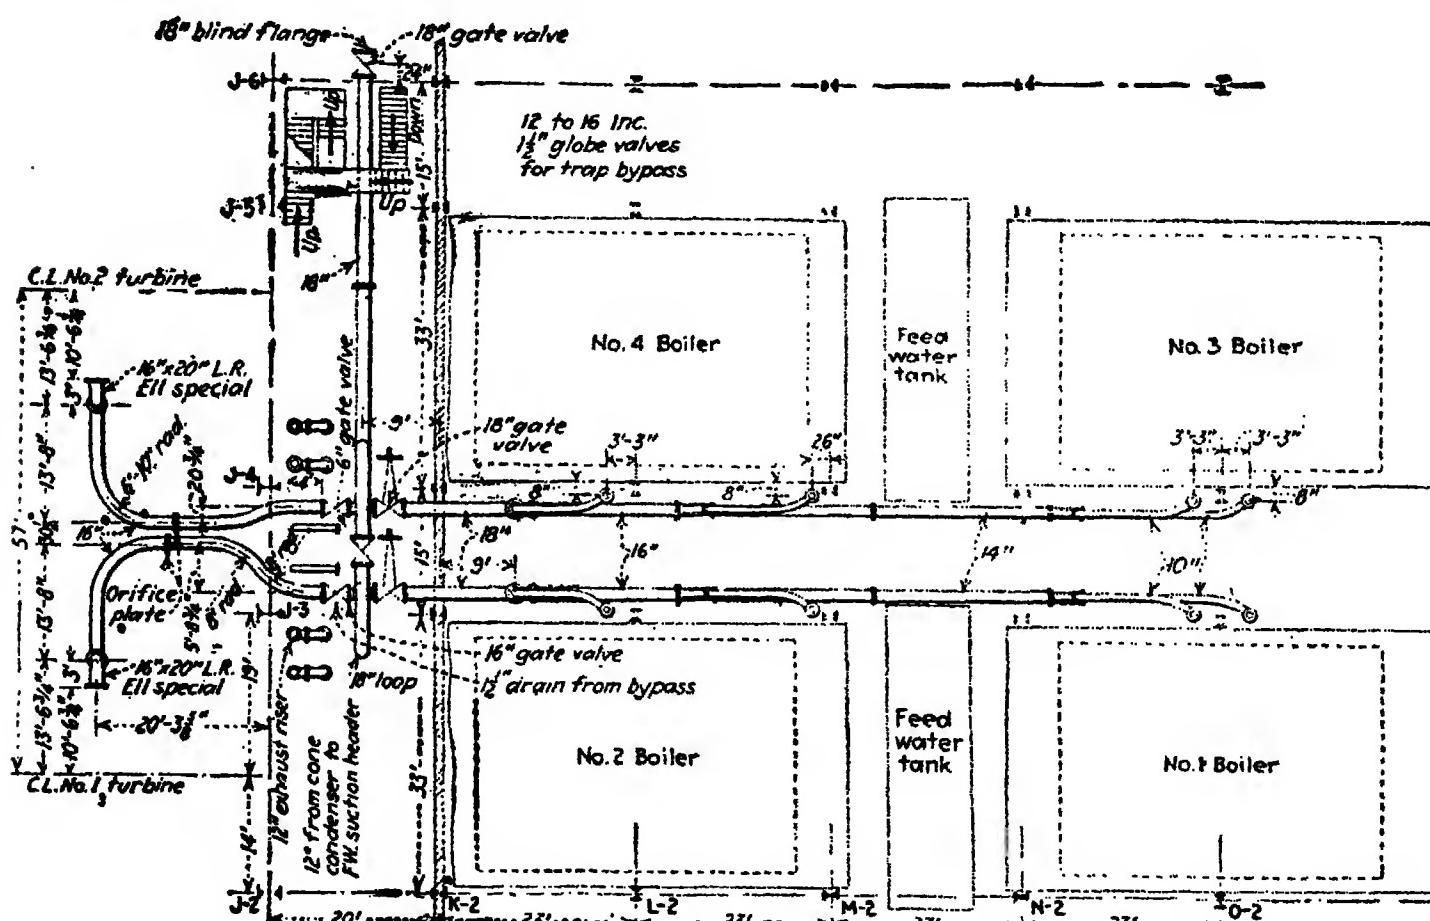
Main steam piping in Avon station. The location is below the operating floor of the boiler room.
